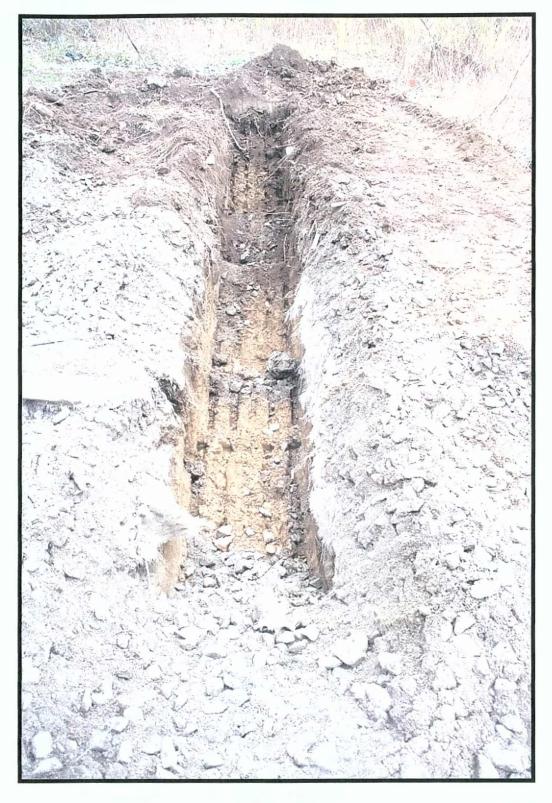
Backhoe Trench 3a - View North From Southern End of Trench
